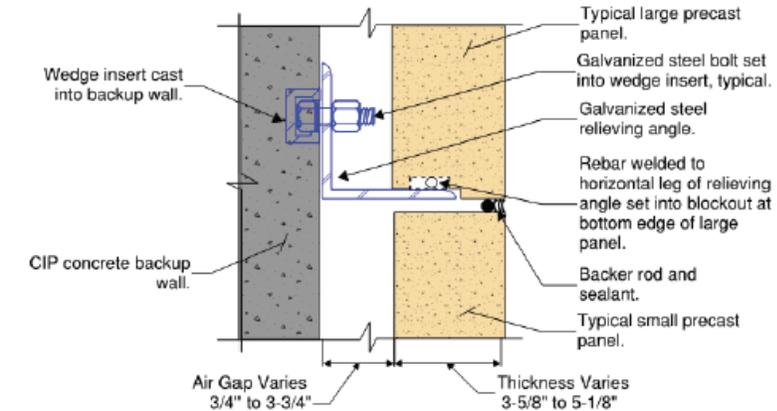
SECTION DETAIL - RELIEVING ANGLE / TYPICAL
